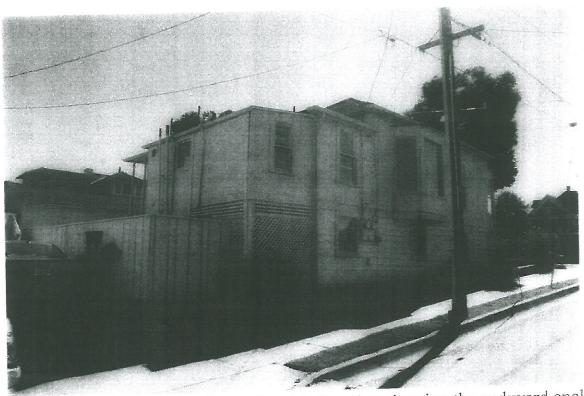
Looking SE at the rear (north) elevation showing the awkward enclosed porch addition & dead space below, Kent Seavey, October 8, 2016.
